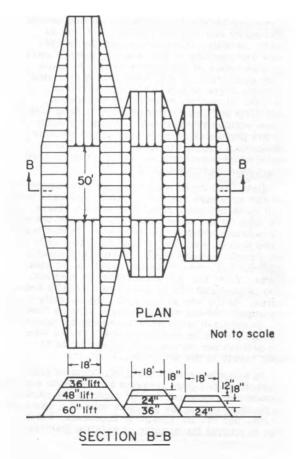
Plan and Section of Rockfill Test Section, Carters Dam, USA
